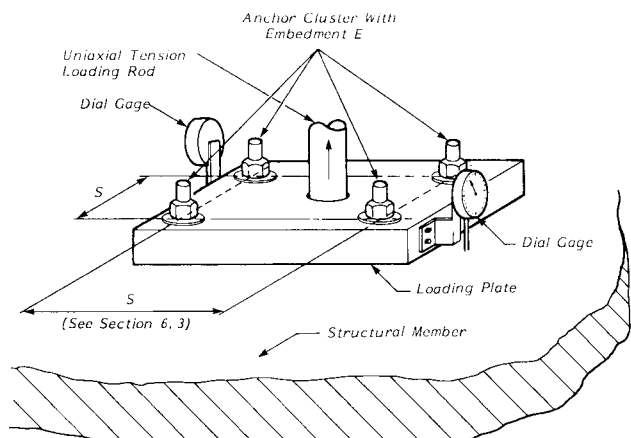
Typical Method of Applying a Test Load to a Cluster of Anchors in the Test Area of a Structural Member
